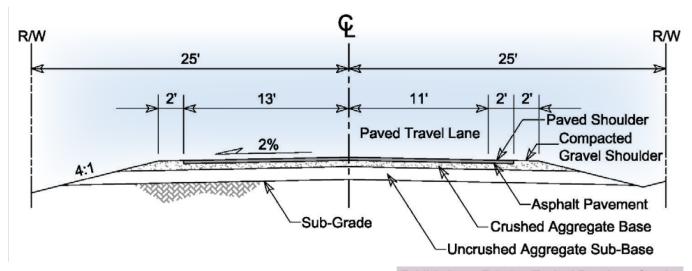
Existing Typical Roadway Section Source: provided by District Engineer, Nampa Highway District
